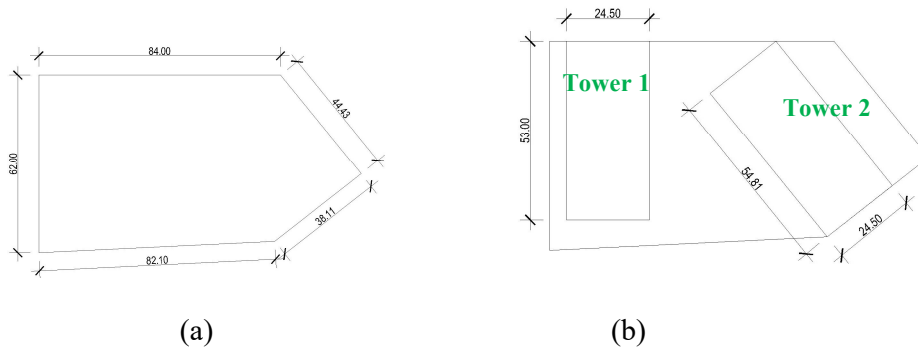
Plan view of the building (a) from ground to 6th floor (b) 6th - 30th floor)
